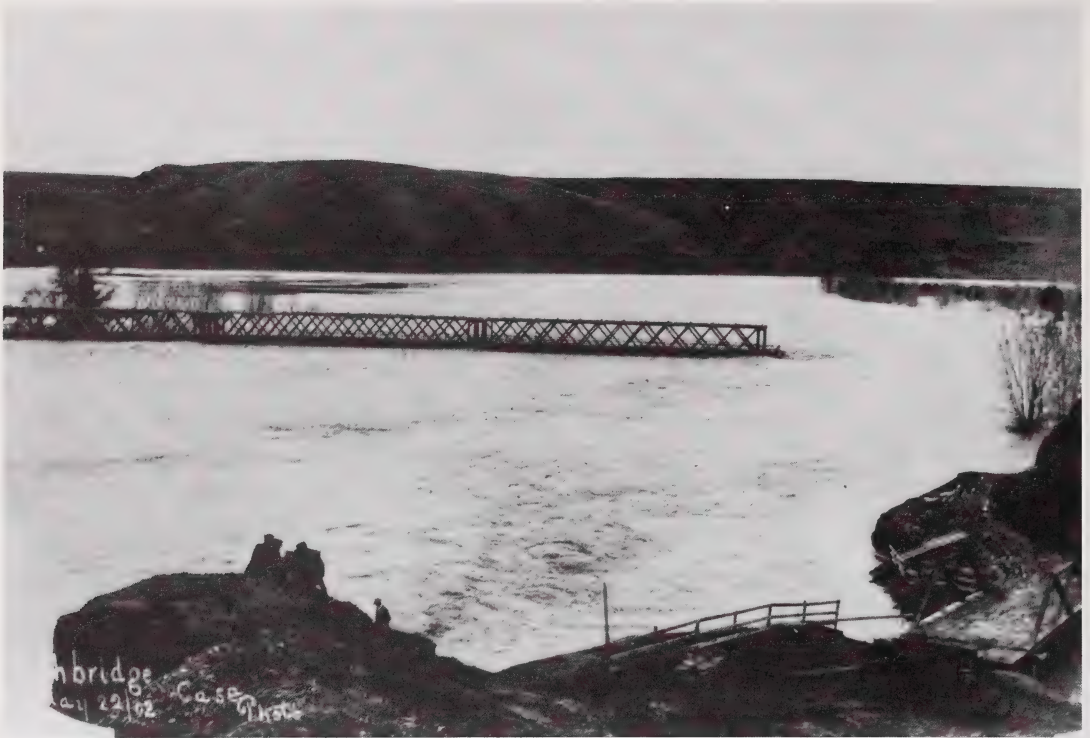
Flooding, Oldman River near Lethbridge, May 22, 1902. Photo taken on east side of river valley just upstream of present day storm sewer outlet, which is approximately 20 feet upstream of old bridge piers, which are still visible and 600 feet downstream of the new HWY #3 bridge. (Photo from the Archives, Sir Alexander Galt Museum, City of Lethbridge)
